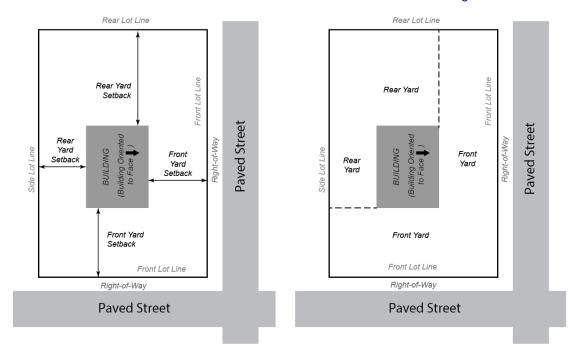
E: Typical lot lines and setback locations for a corner lot with the building oriented toward the wider street frontage (left image) and typical yard locations (right image).
